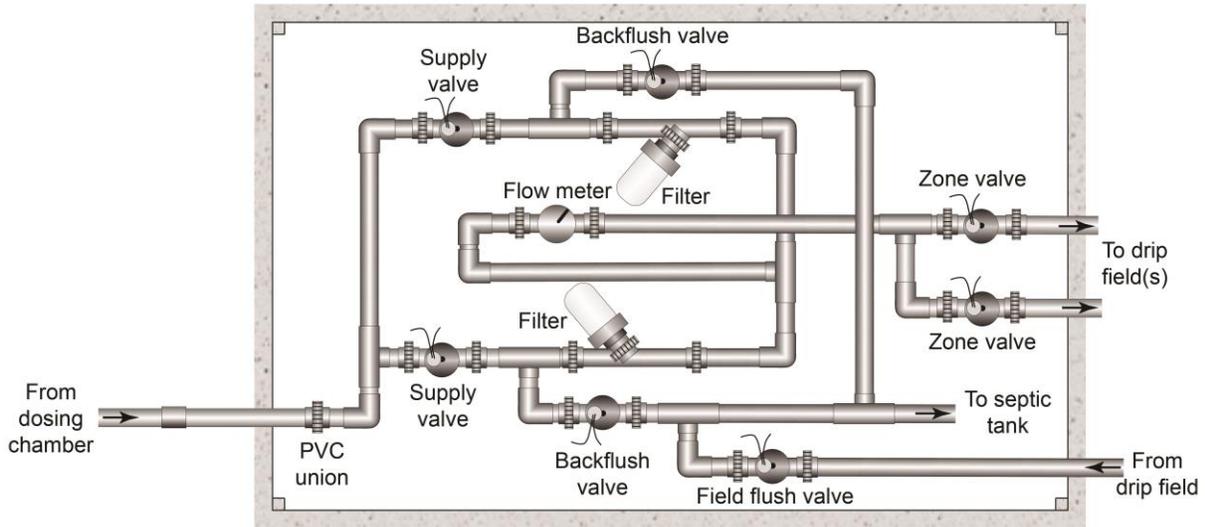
Overhead view of filter, valve, and meter assembly for a noncontinuous flush system.
